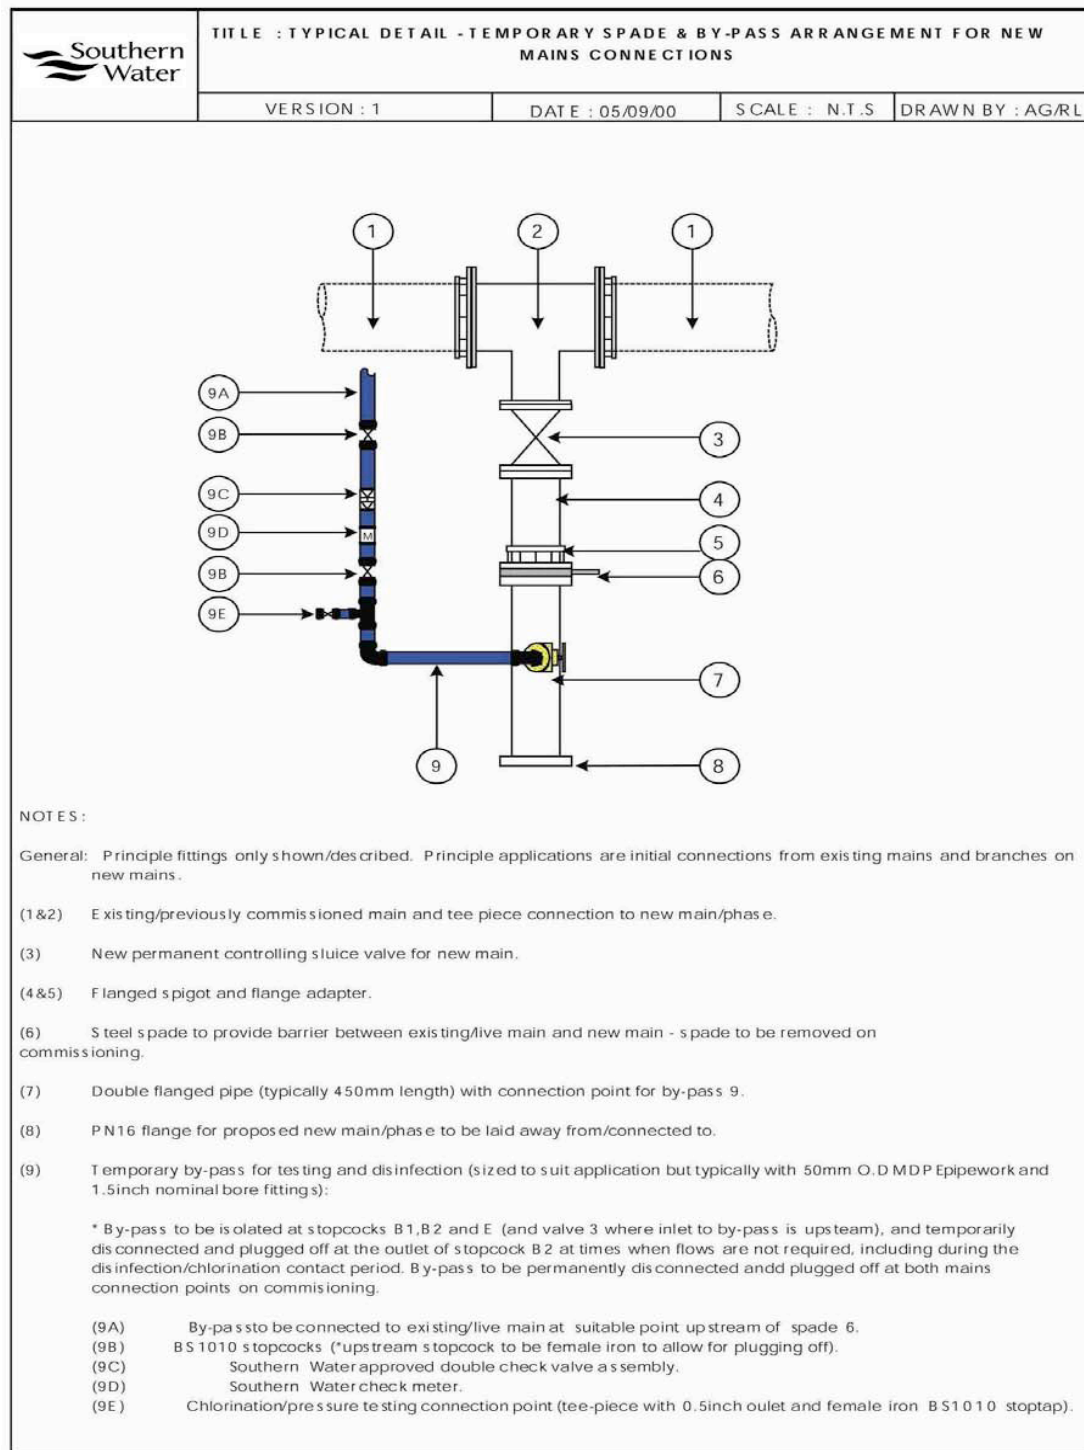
TEMPORARY SPADE AND BY-PASS ARRANGEMENT
